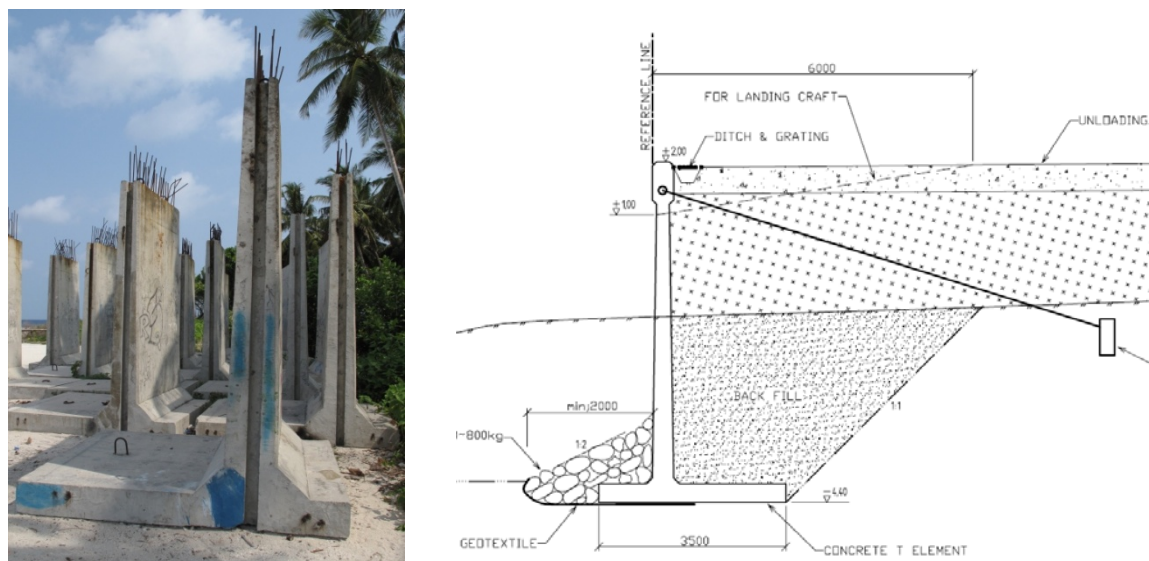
Image Concrete T-Blocks (3.7 m x 2.6 m) available from Works Cooperation (left) and how the block fits to a typical quay-wall construction with reinforcements with rubble mound foot and geotextile lining.
